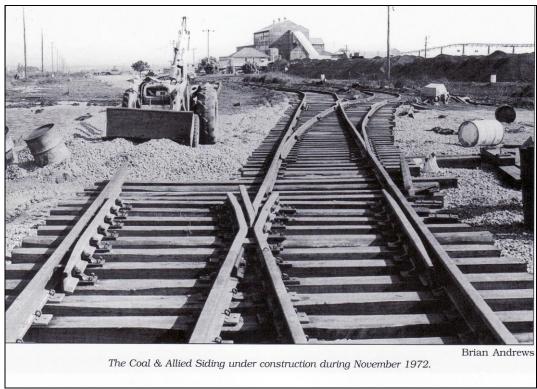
Coal and Allied siding under construction during November 1972. The Coal Preparation Plant and stockpiles can clearly be seen. Source: Brian Andrews, Coal, Railways and Mines
